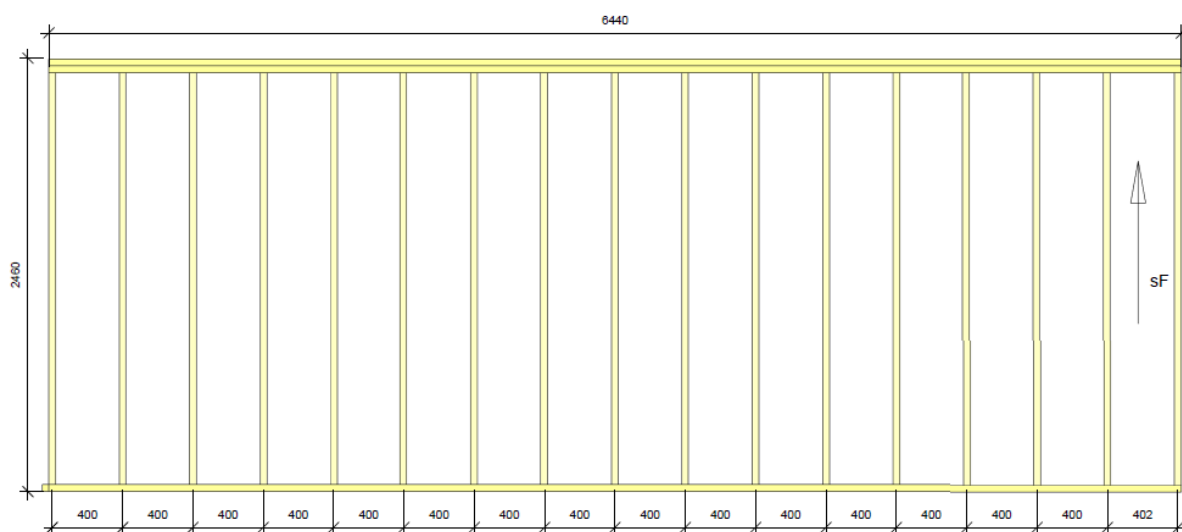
Typical production drawing of an open panel timber frame wall with 400mm vertical spacing
